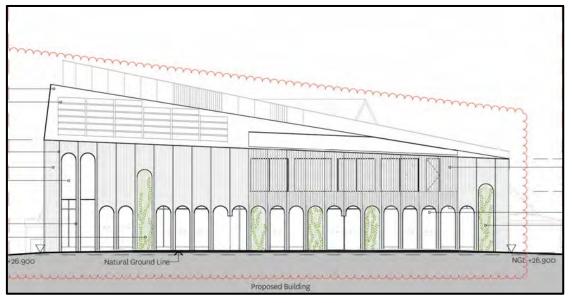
Excerpt from Drawing No.TP03.1 Streetscape Elevations (Endorsed)
